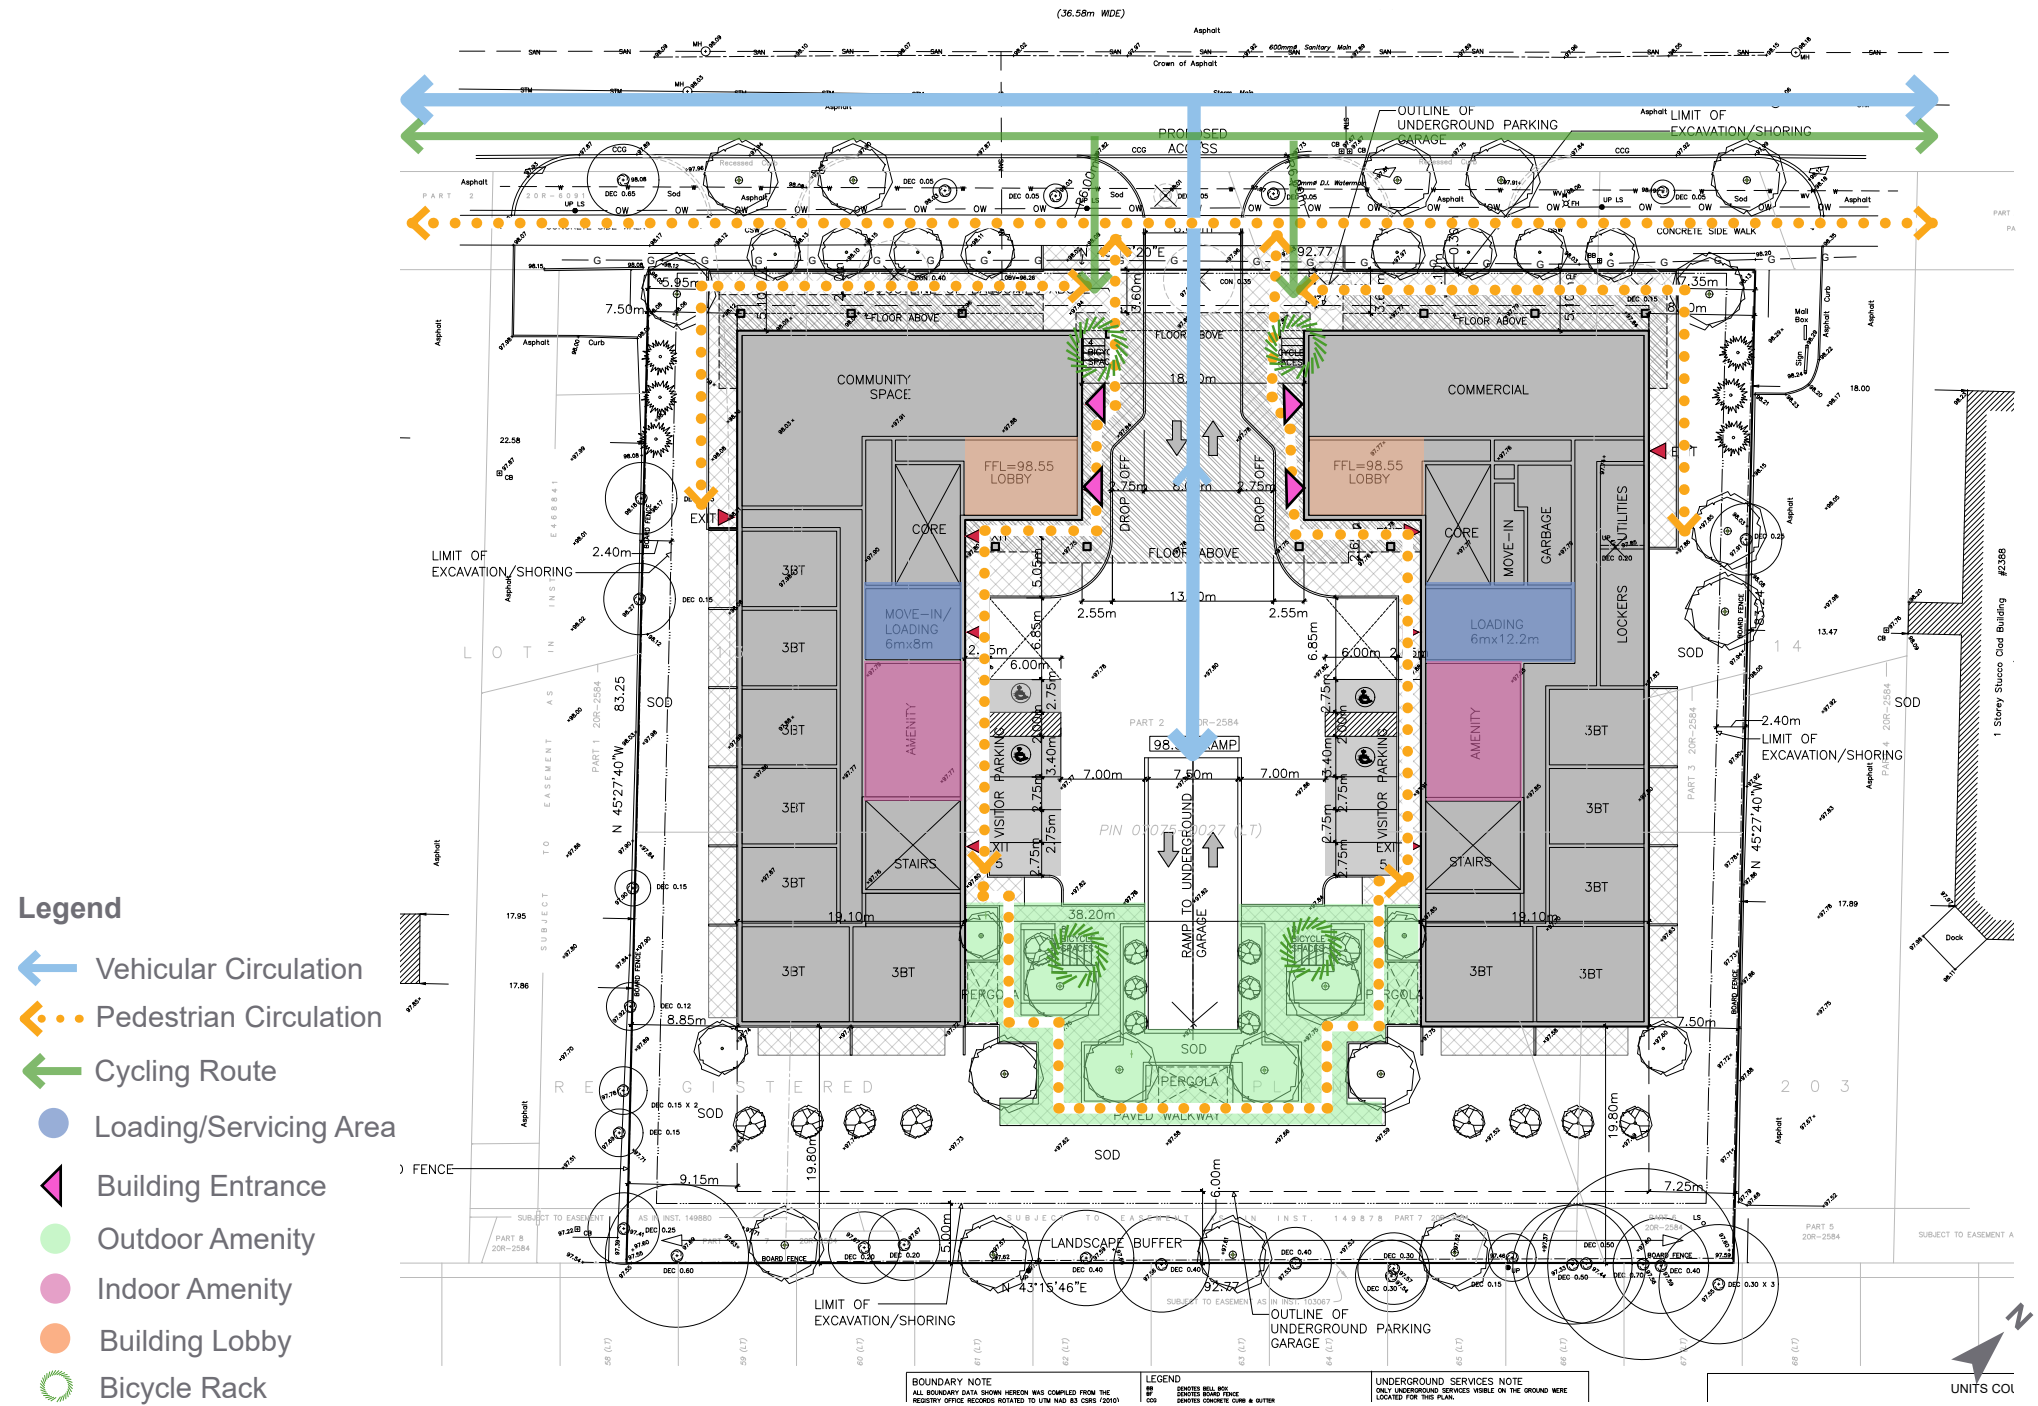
Circulation Plan - Site Plan Prepared by Terry Martino Architects and Annotated by Weston Consulting
